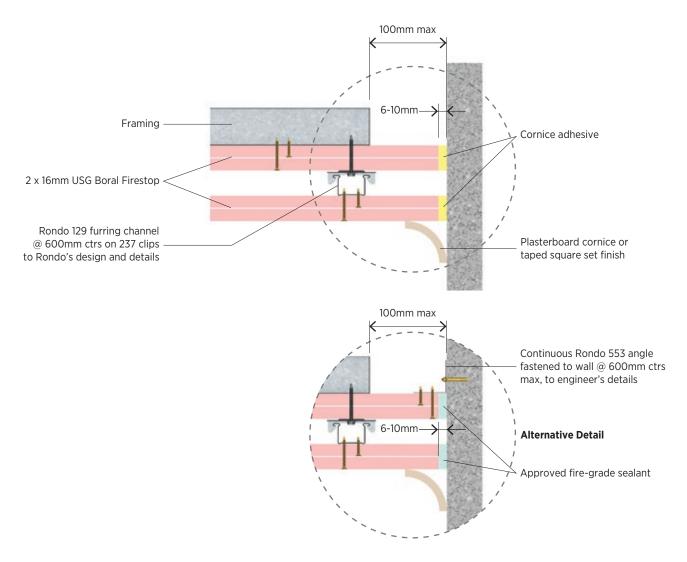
Typical Perimeter Detail - FRR 120/120/120
